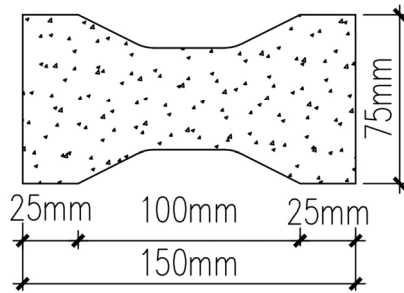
Dimensions of dumbbell-shaped specimens and tensile fixtures.
